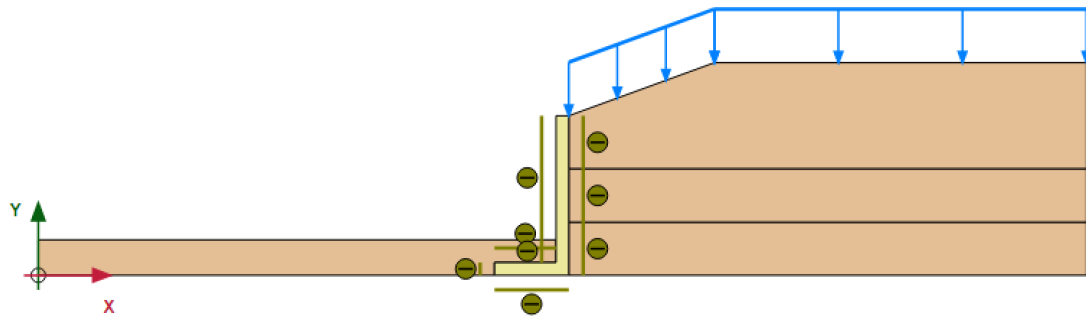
Retaining wall with backfill slope 20° and no TDA backfill
